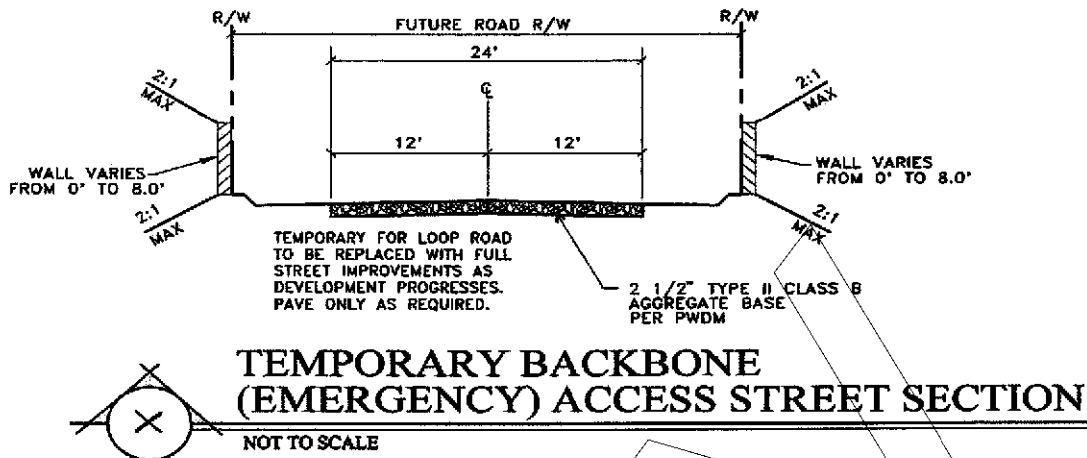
A – Temporary Backbone (Emergency) Access Street Section
